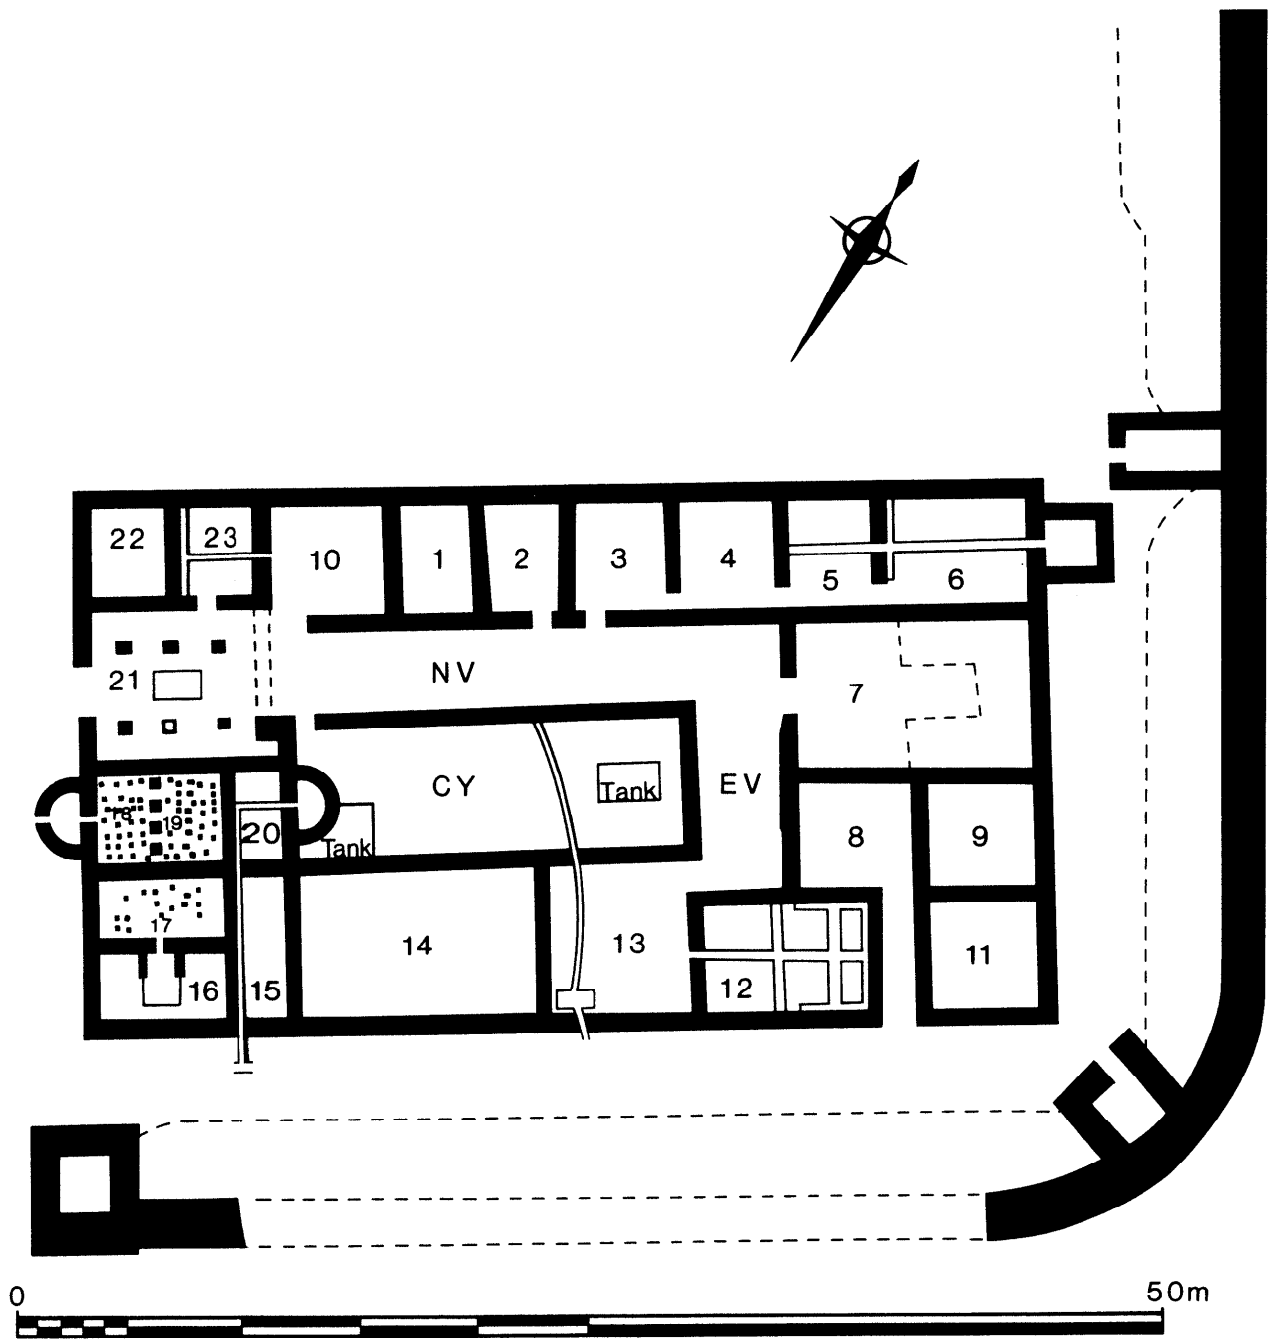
The South Shields courtyard house: plan showing primary arrangement
